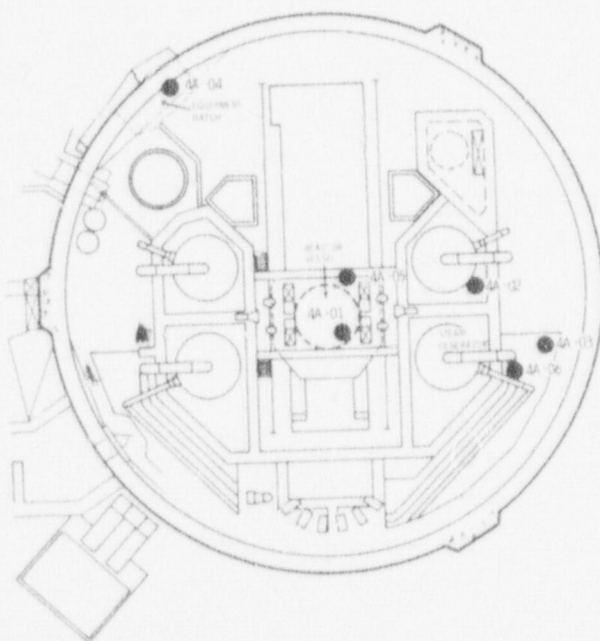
Source Locations in Containment Building At Operating Floor and Above (>93-Ft Elevation)
